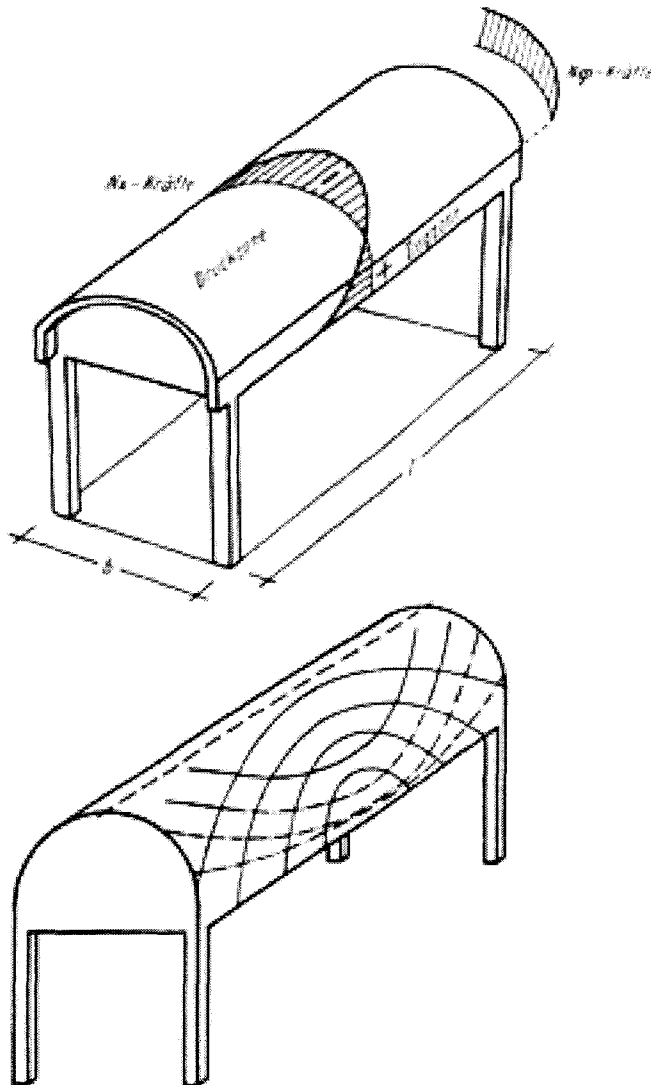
Diagram of cylindrical shell structural actions showing (top) beam behavior through section and arch action at ends, and (bottom) isostatic lines of tension and compression through shell plane. From Jurgen Joedicke, *Shell Structures*.
